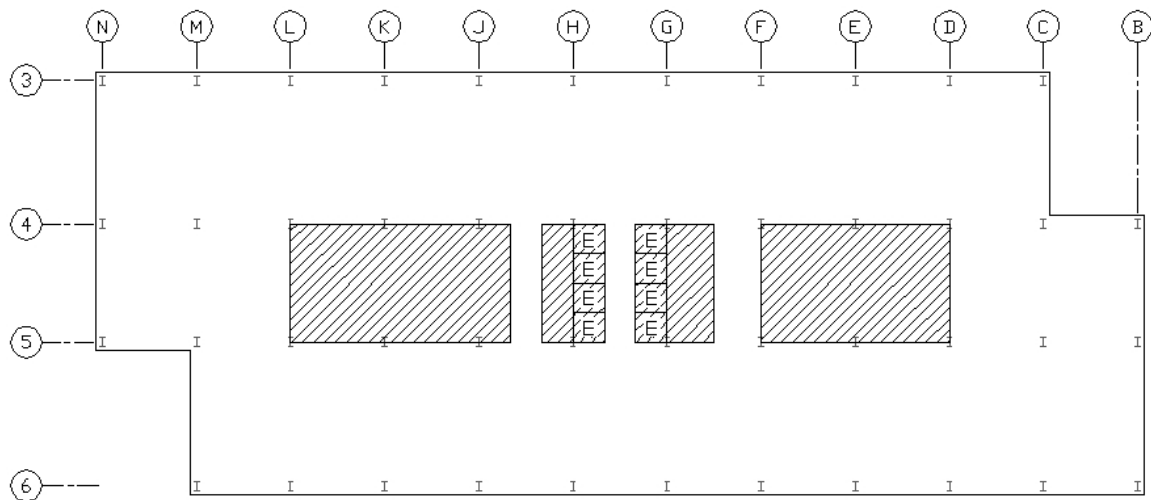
NOC VII Floor Framing Layout (18th and 24th Floors)
